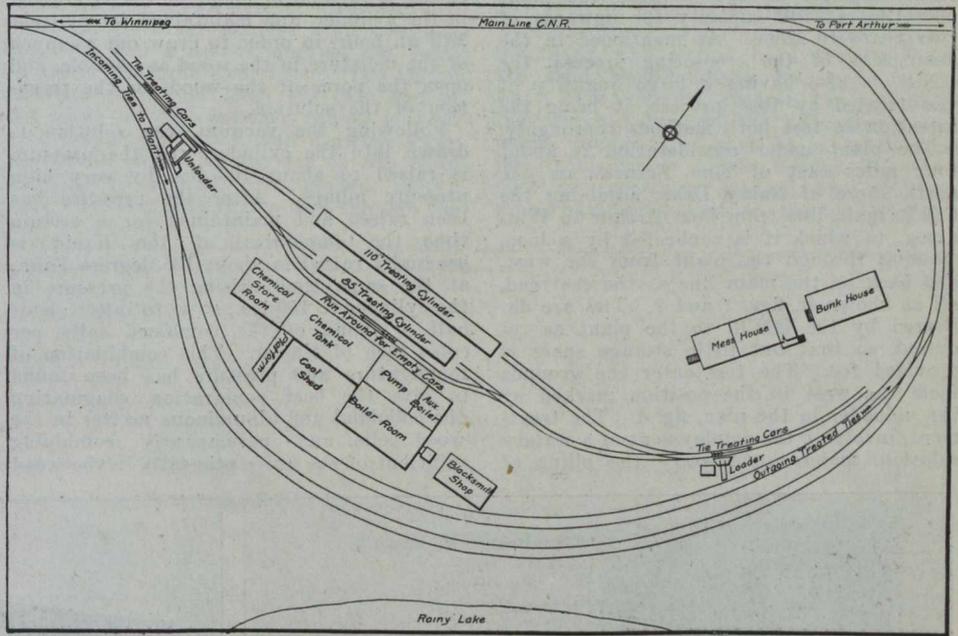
Layout of Buildings and Yard of a Modified Zinc Chloride Tie Treating Plant.
